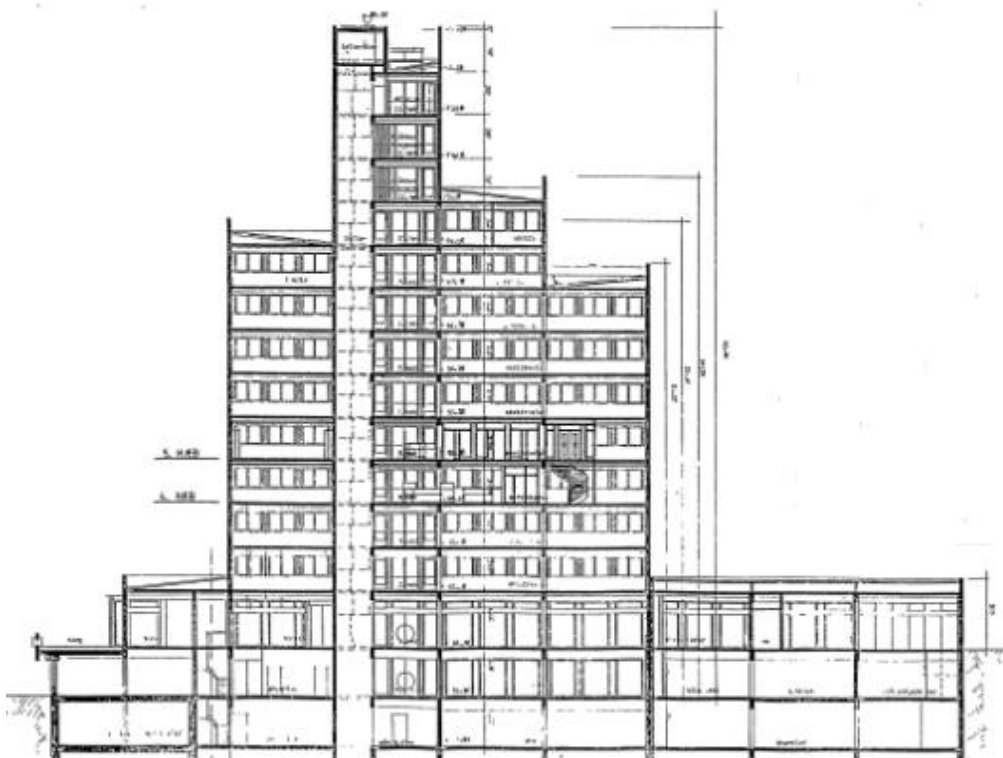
Vertical cross section of the building (Björnsson, 1998).
